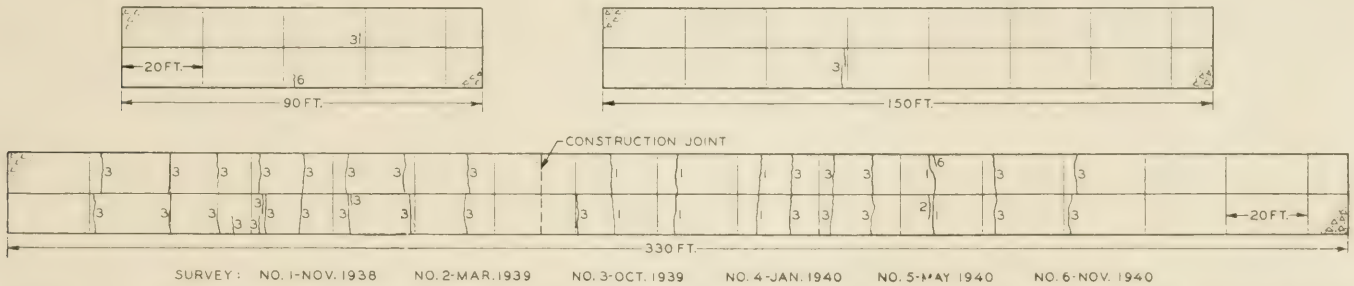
TYPICAL CRACK SURVEY SHEET FOR INTERMEDIATE-LENGTH SECTIONS REINFORCED WITH 1/2-INCH DIAMETER STEEL; SECTIONS PLACED SEPTEMBER-OCTOBER, 1938.
